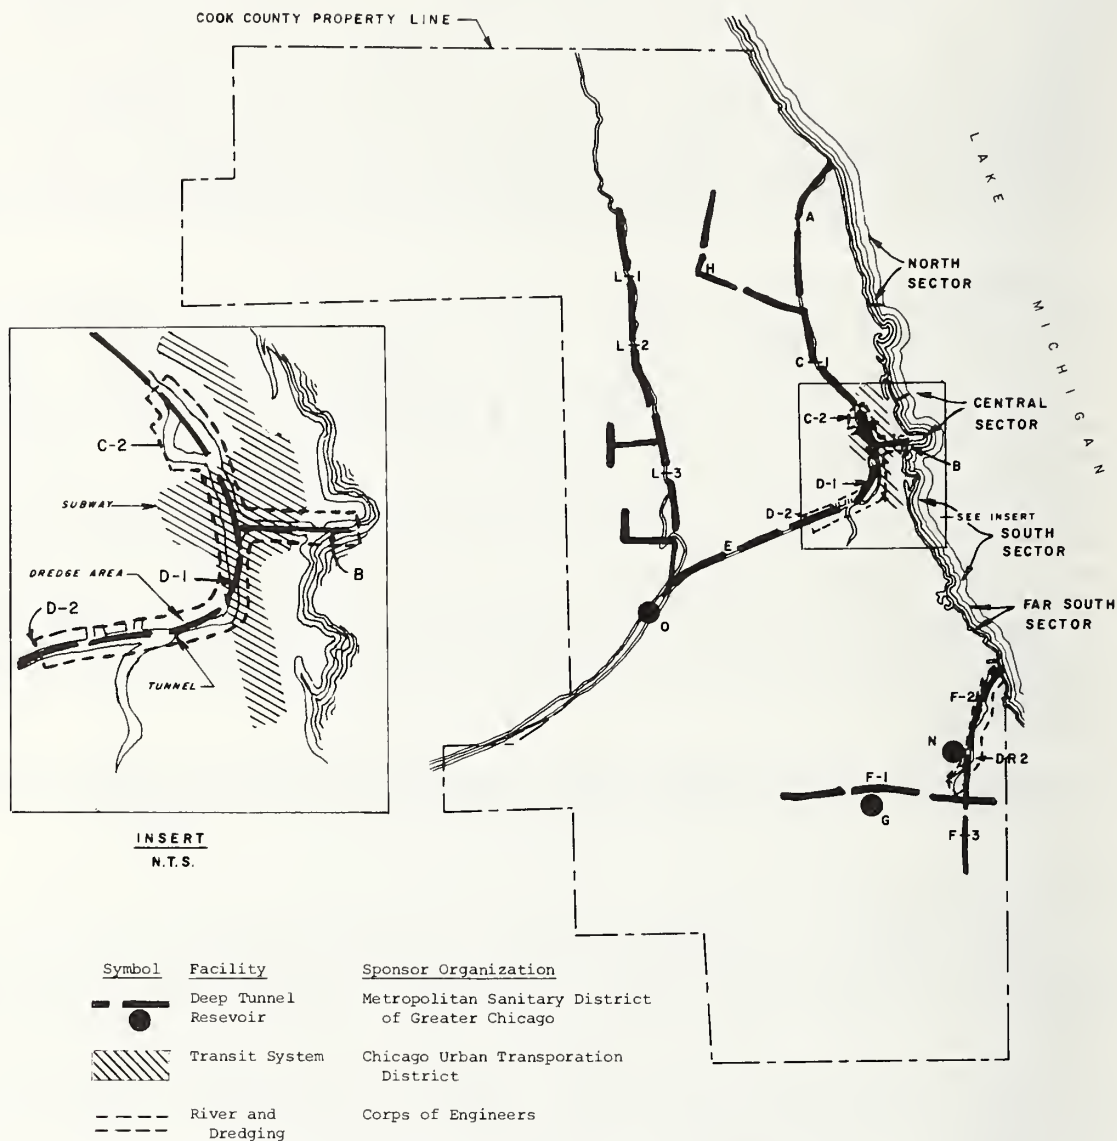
SECTOR LOCATION PLAN FOR LAKEFRONT DEVELOPMENT [10-1]
